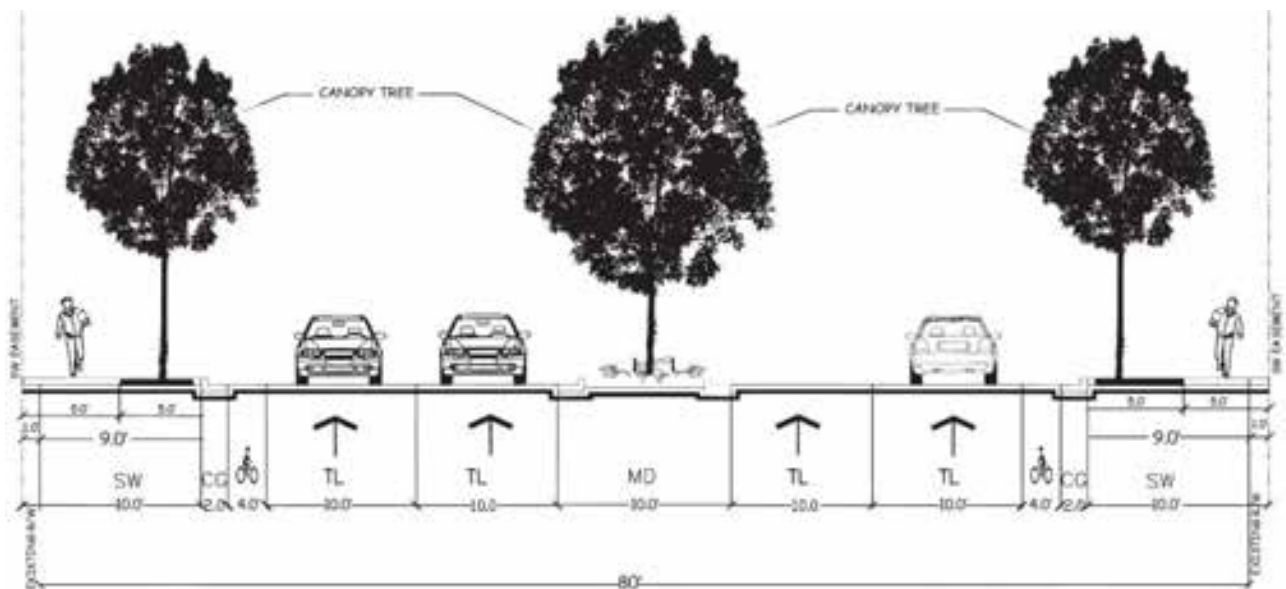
Boynton Beach Blvd. Section from I-95 to Seacrest Blvd.
